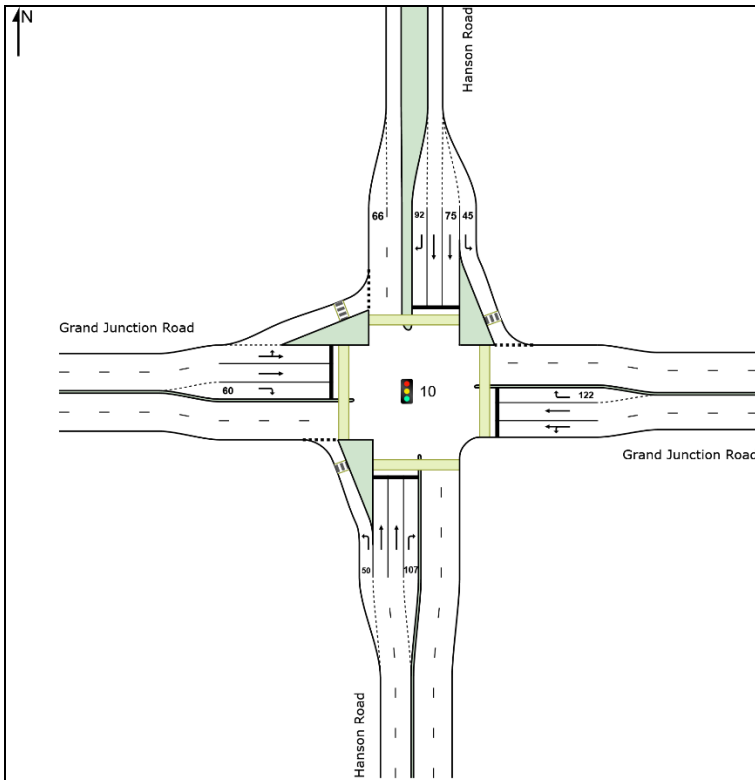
TS010 Grand Junction Road – Hanson Road Site Layout
